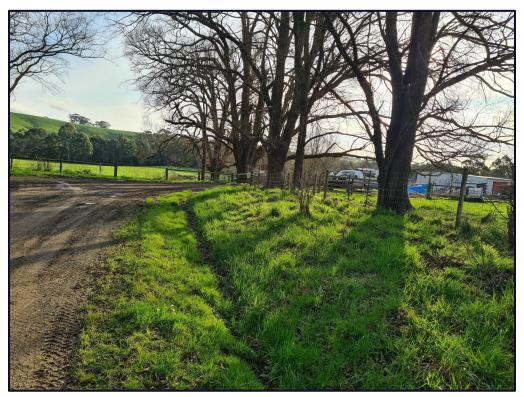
Site photograph looking west at the subject site and proposed access from Brownes Road.
